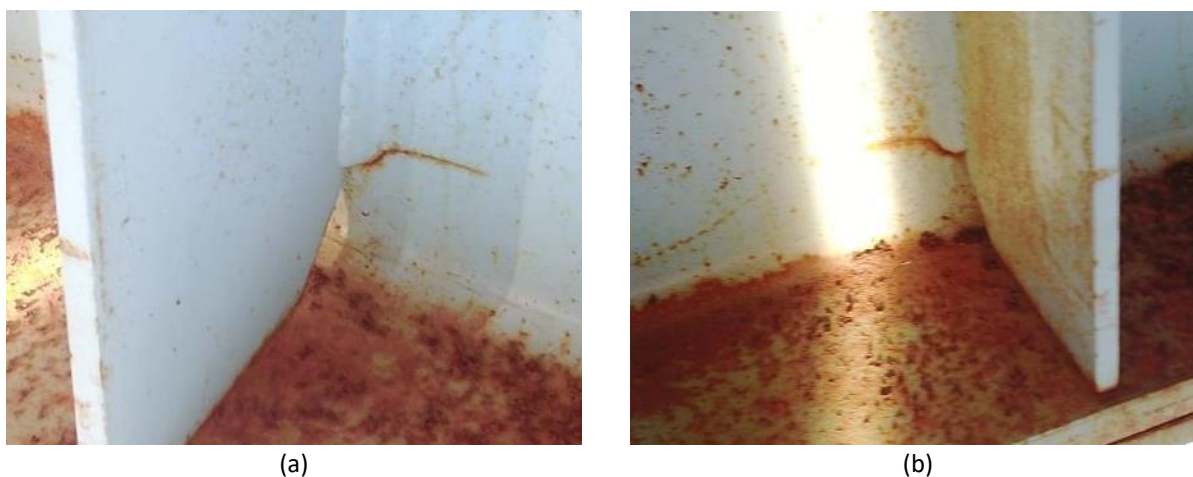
DJI Mavic images of fatigue cracks in a girder specimen: (a) crack on bottom-right and (b) crack on bottom left
